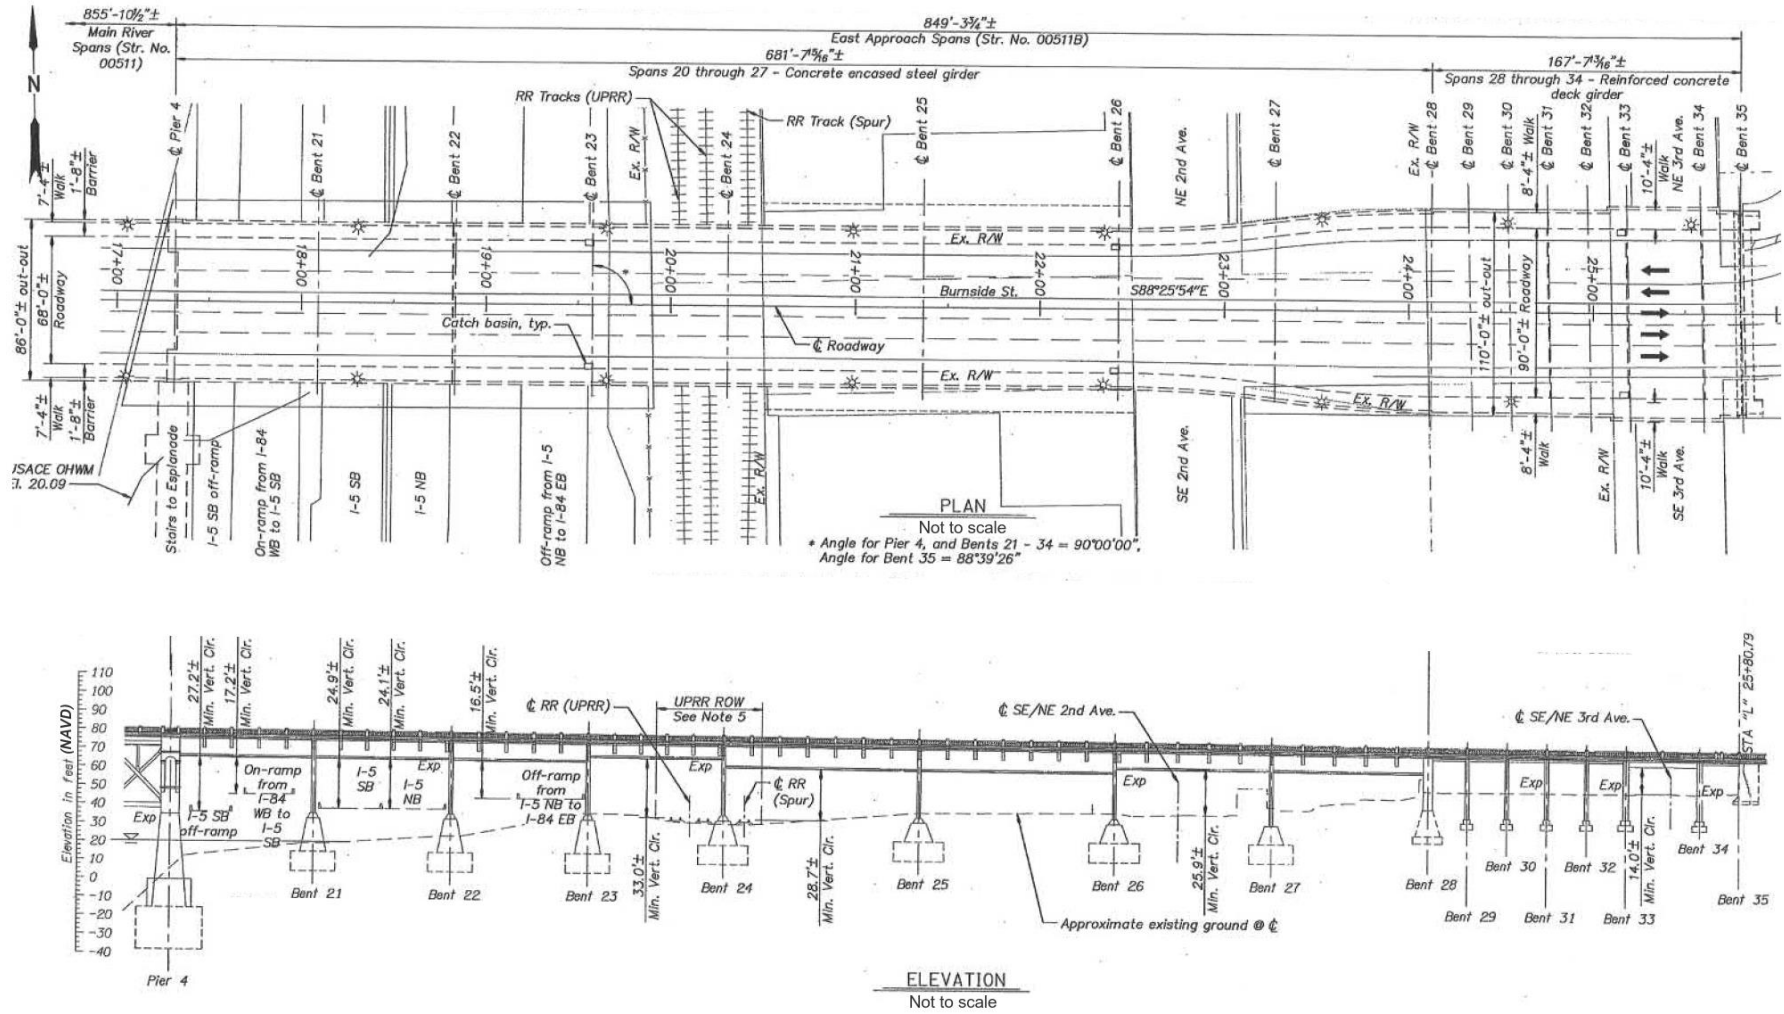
Existing Plan and Elevation Views – West Approach Bridge
